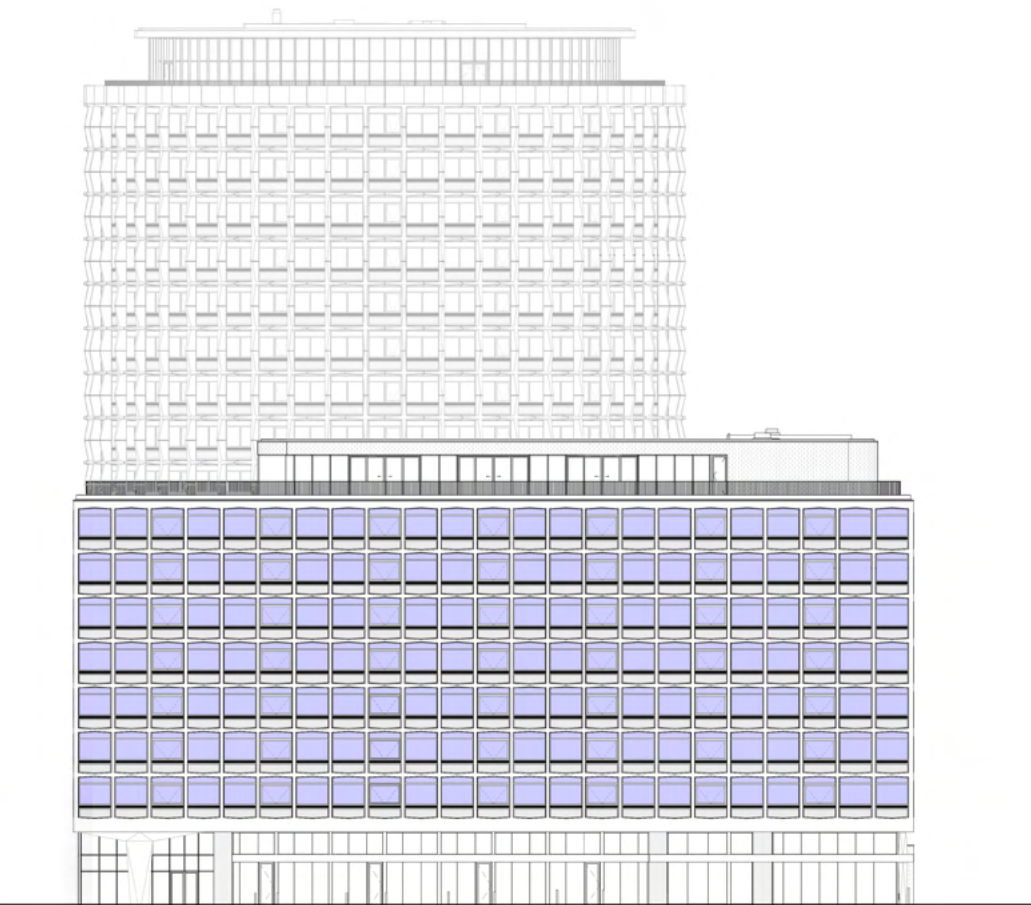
Kingsway West Elevation - MAT 03 location
